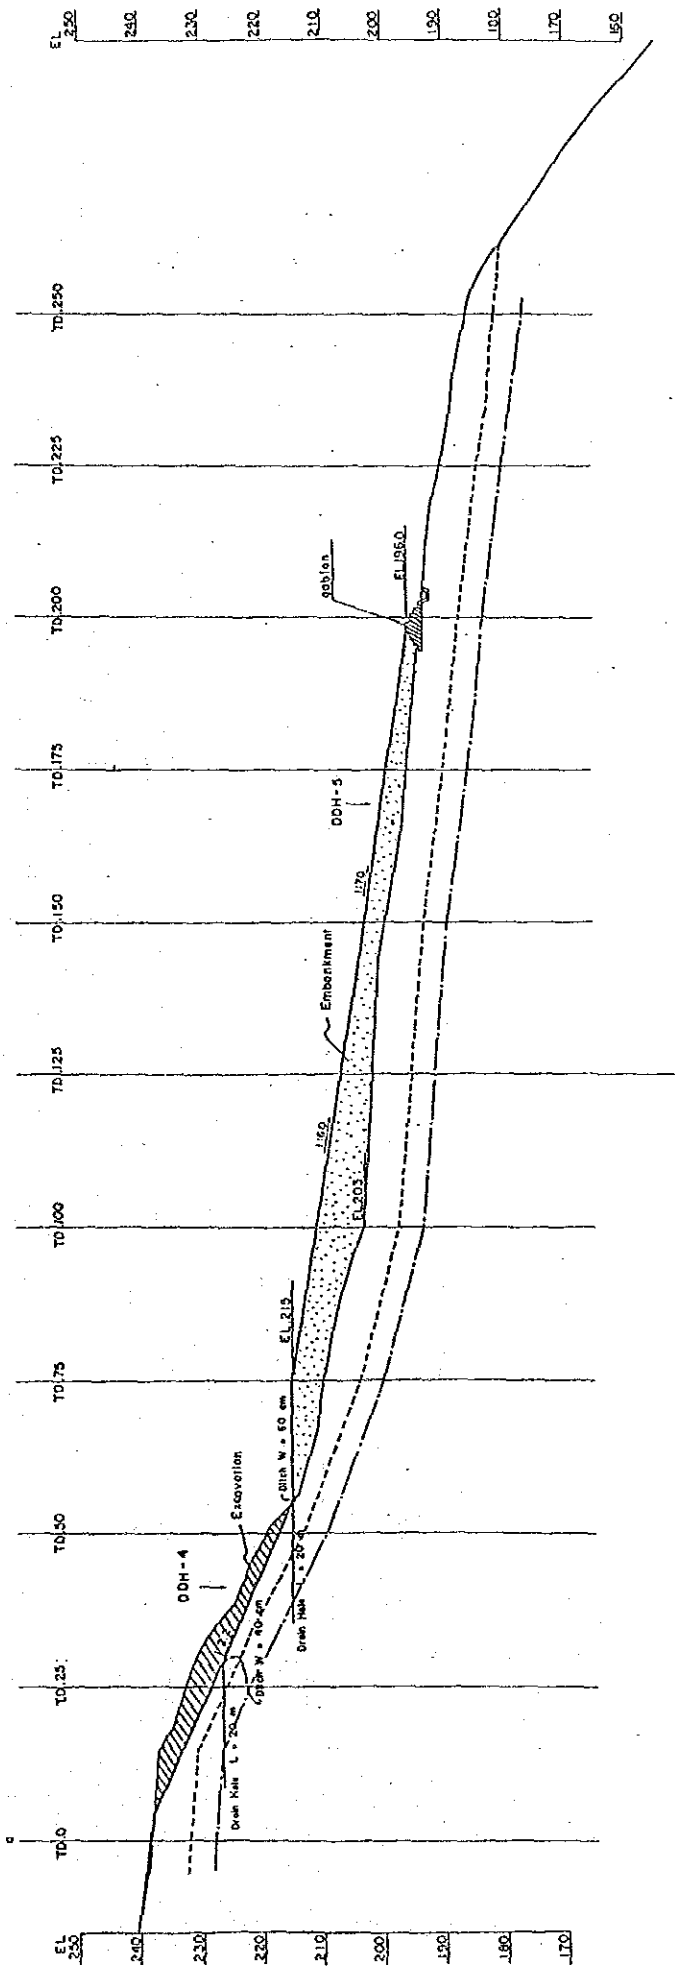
Longitudinal Profile after Slope Reformation (Cross Section B-B)
